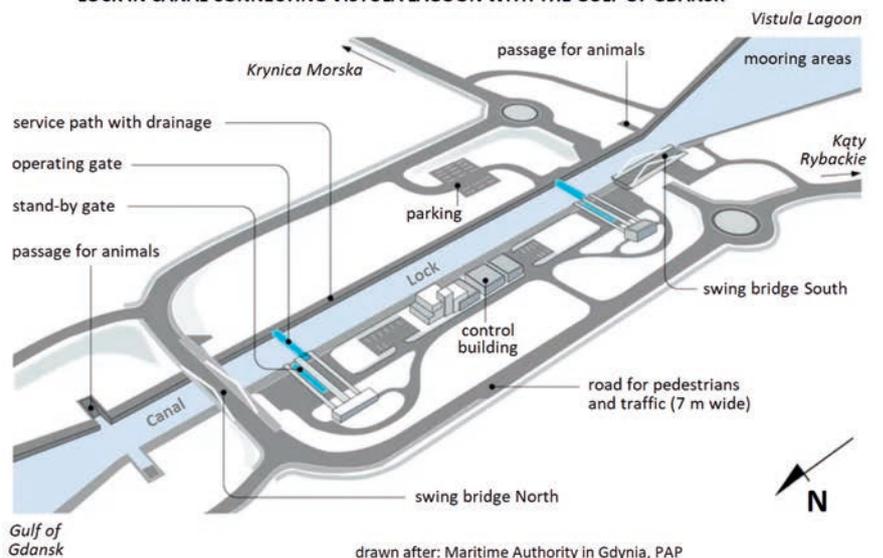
Lock in Vistula Spit Canal, under construction, general layout
